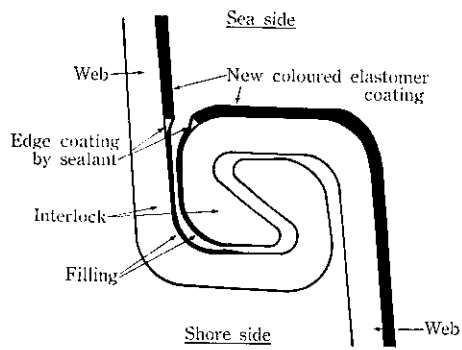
Repair methods of damaged areas of new coloured polyurethane coated steel structures
